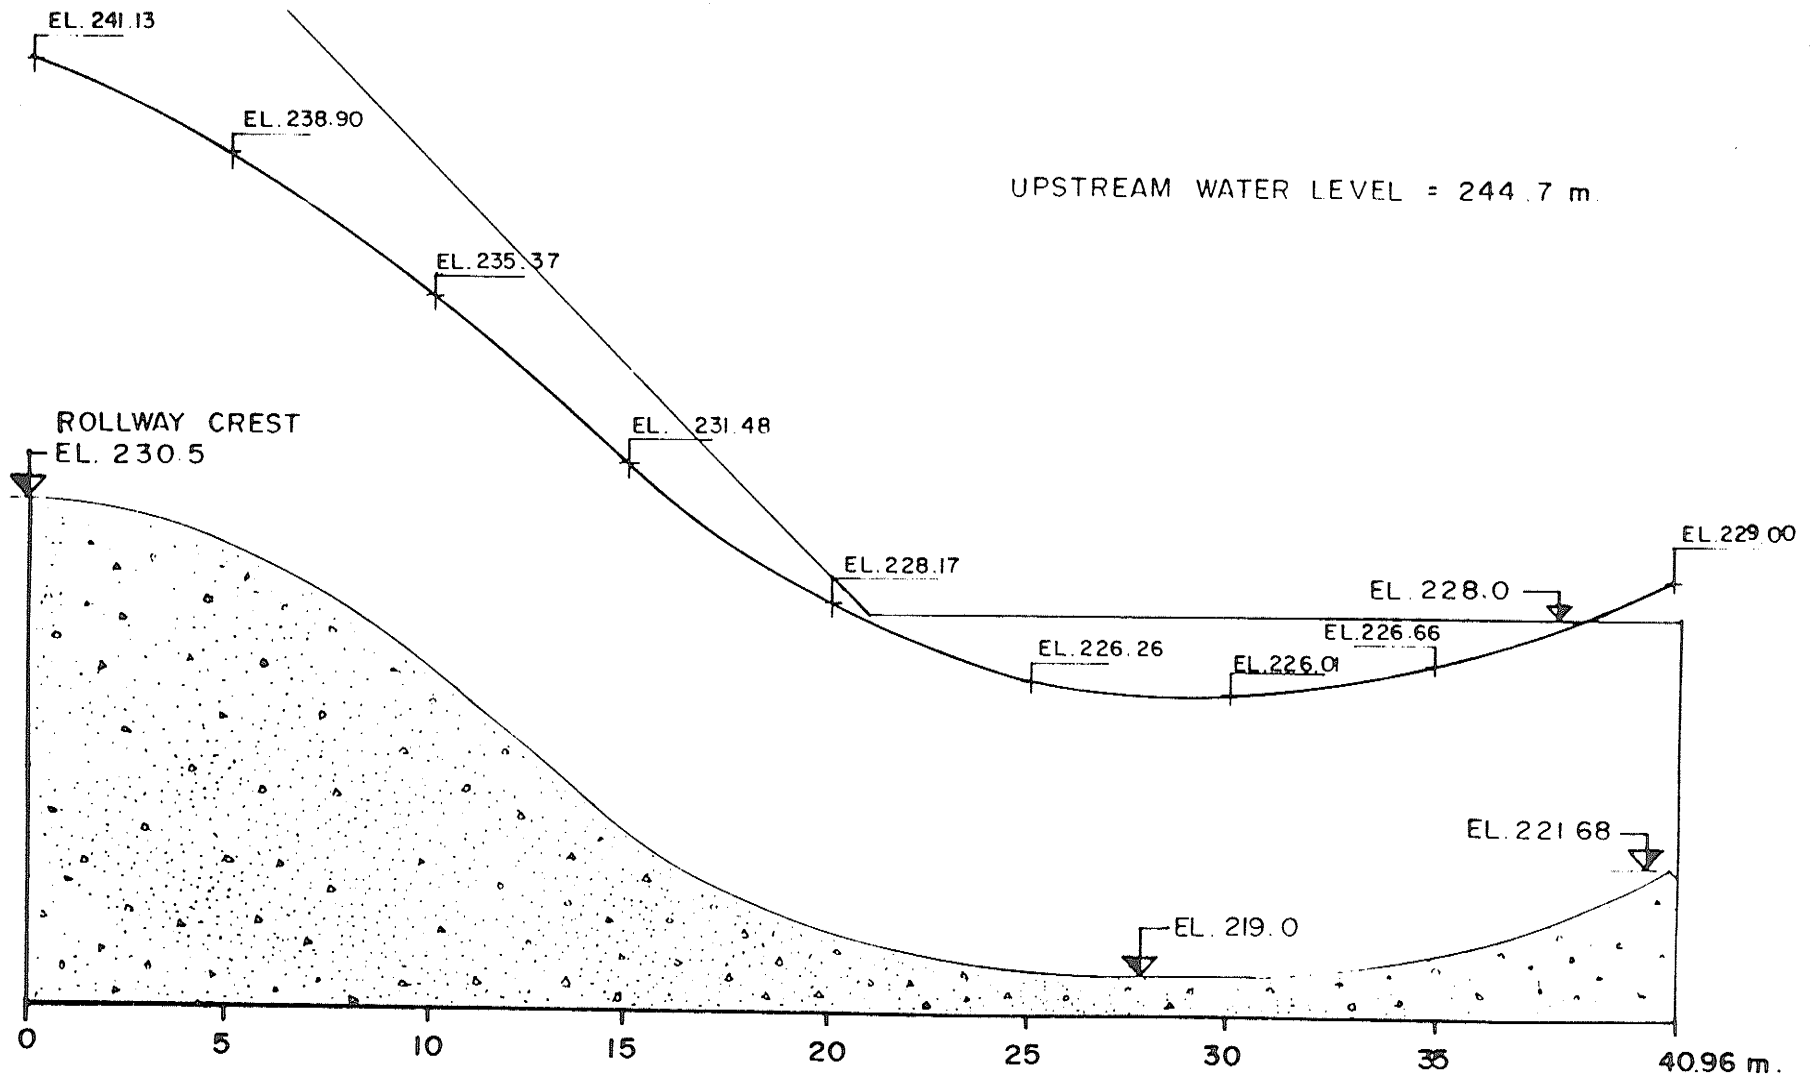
Water Surface Profile Along the Left Pier of the Overflow Spillway With an Upstream Water Elevation of 244.7 m
